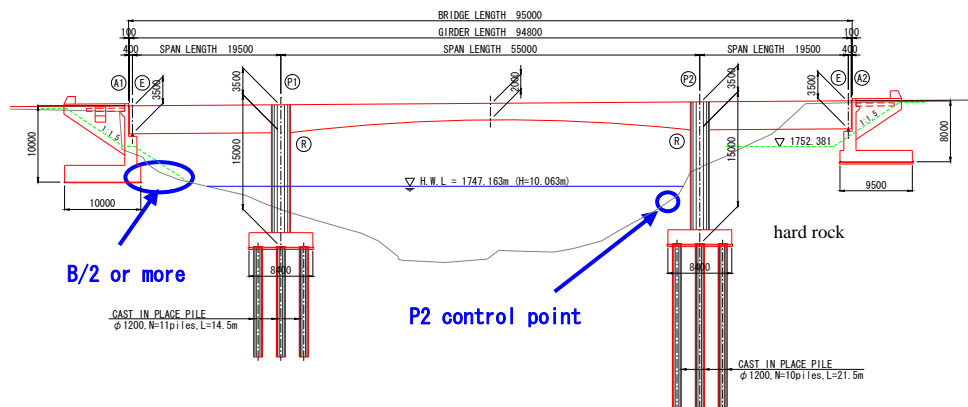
Criteria for the design of the new bridge (Modjo Bridge)
